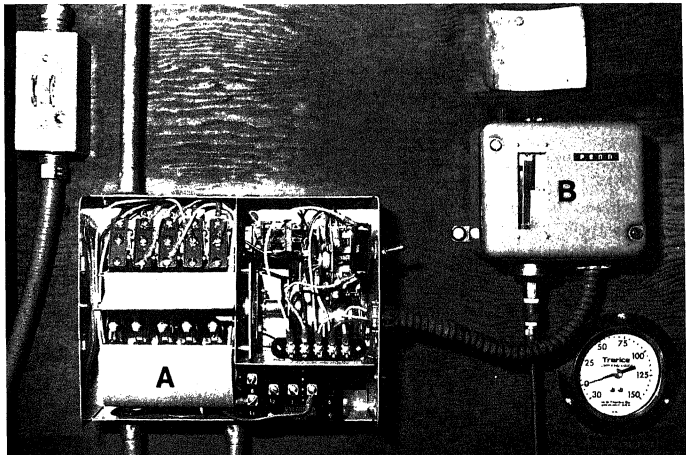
Step controller and pressure-sensor configuration. A. Step controller with modulating motor, single-pole double-throw mini switches, and mouse trap relay assembly. B. Pressure sensor that controls the step controller.
